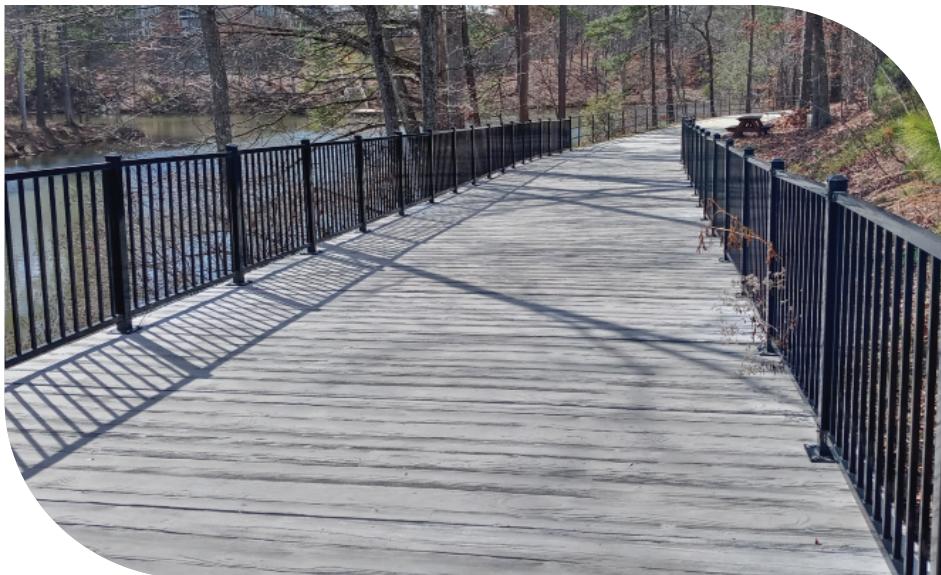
Concrete boardwalk, Peachtree Corners, GA.
